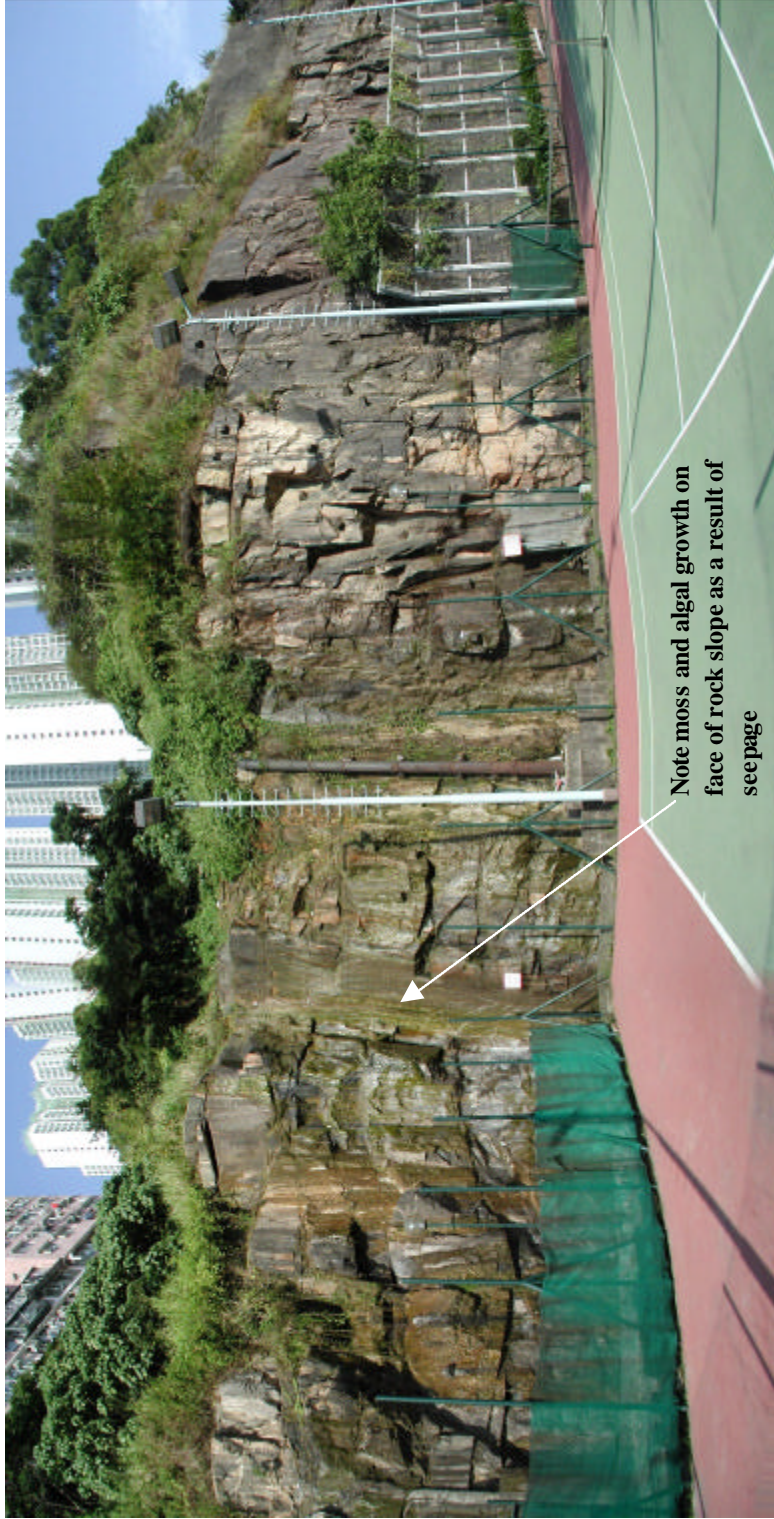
Panoramic View Showing Northern Section of Slope No. 11NE-D/C45 Looking North
